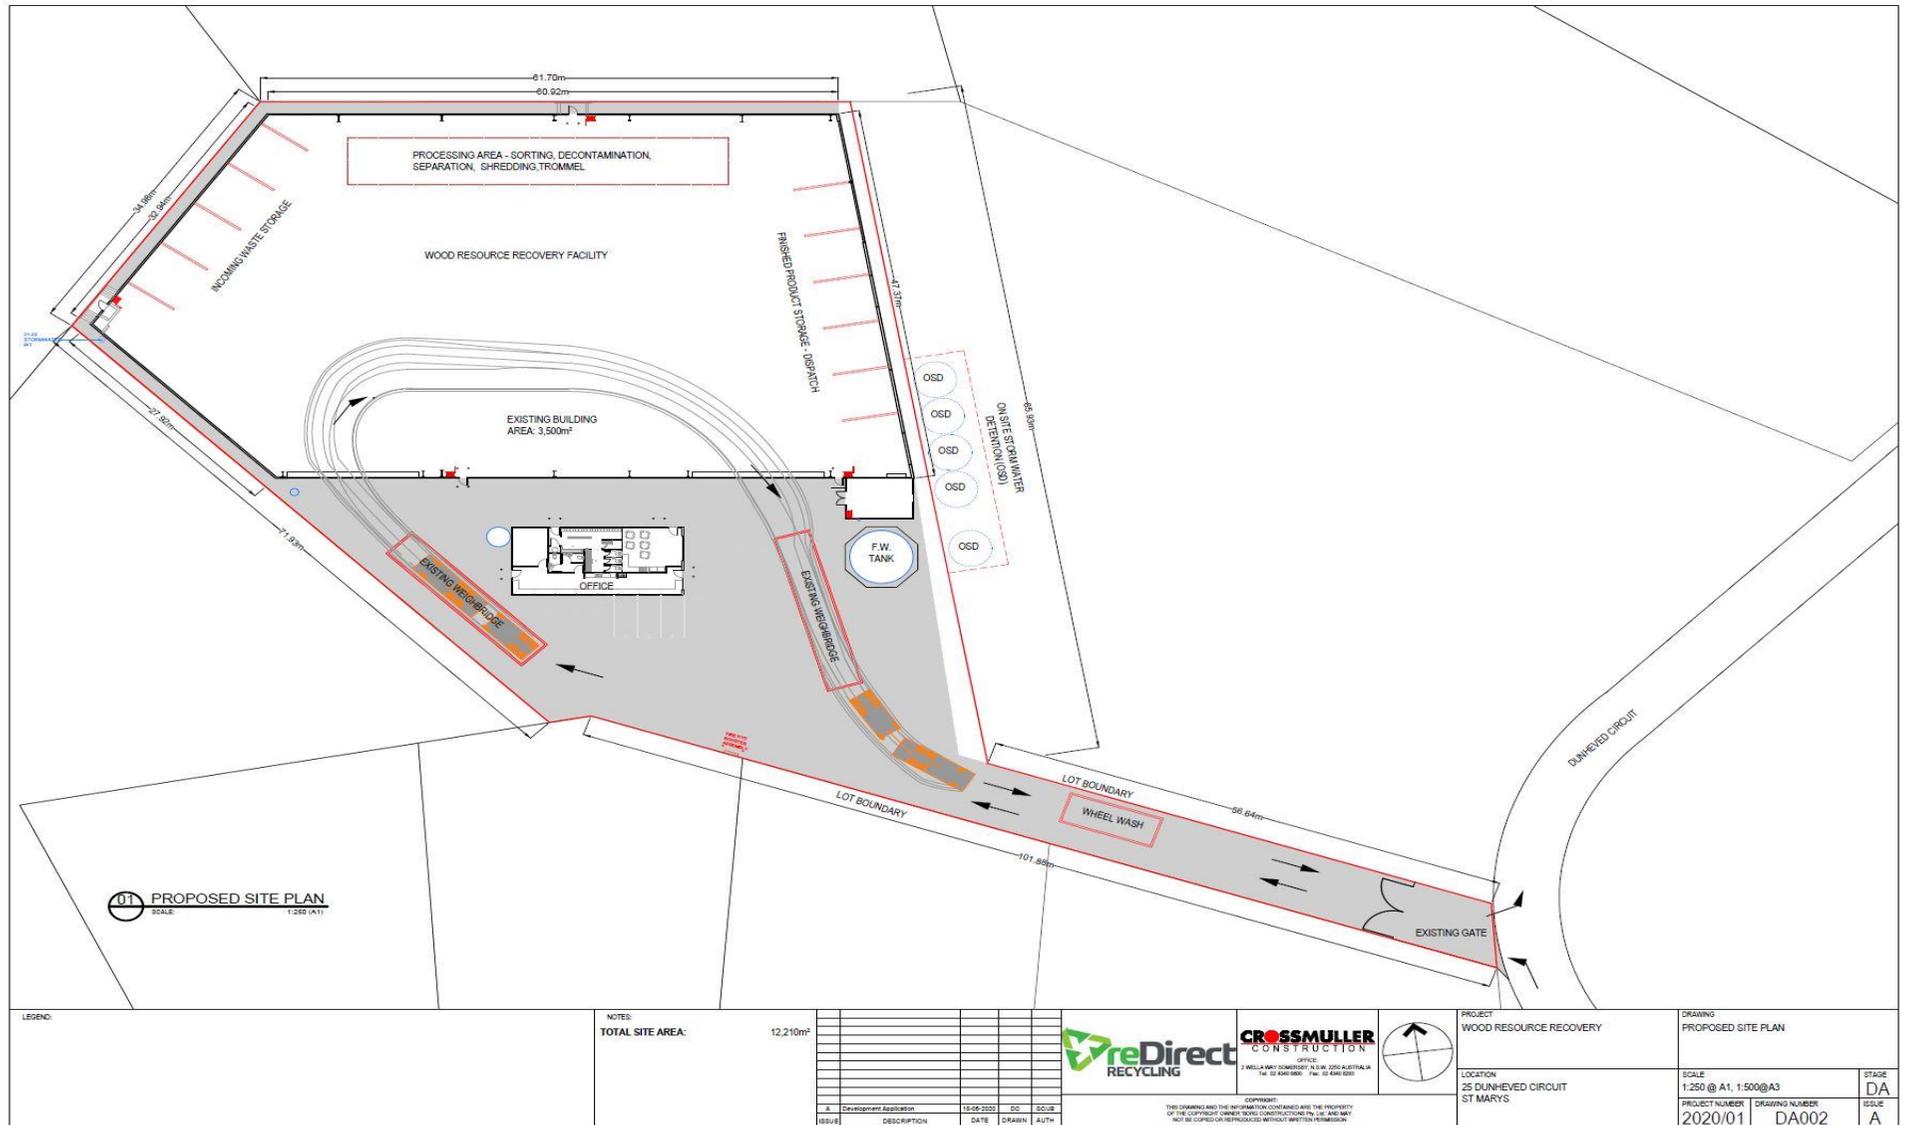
Proposed site layout- 25 Dunheved Circuit, St Marys
